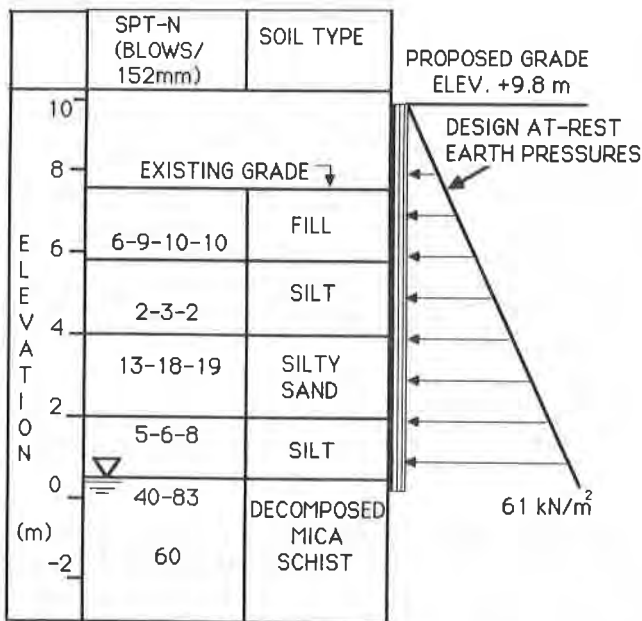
TEST BORING RESULTS AND DESIGN AT-REST EARTH PRESSURES AT JFK BLVD WALL
